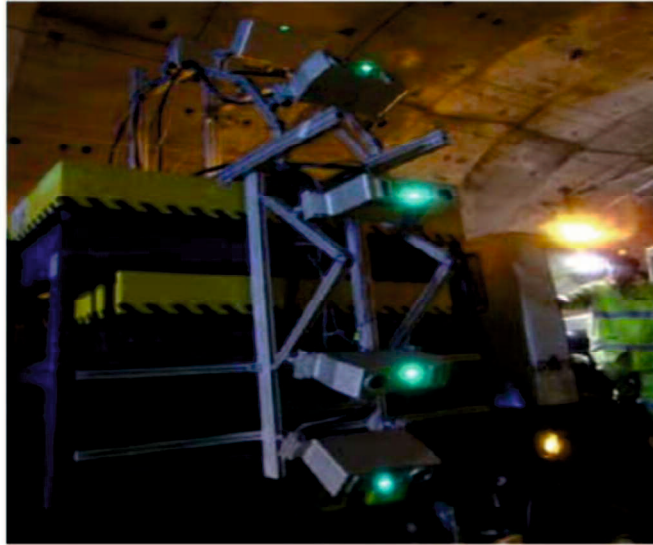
The tunnelling system sensor structure²⁵⁾.
